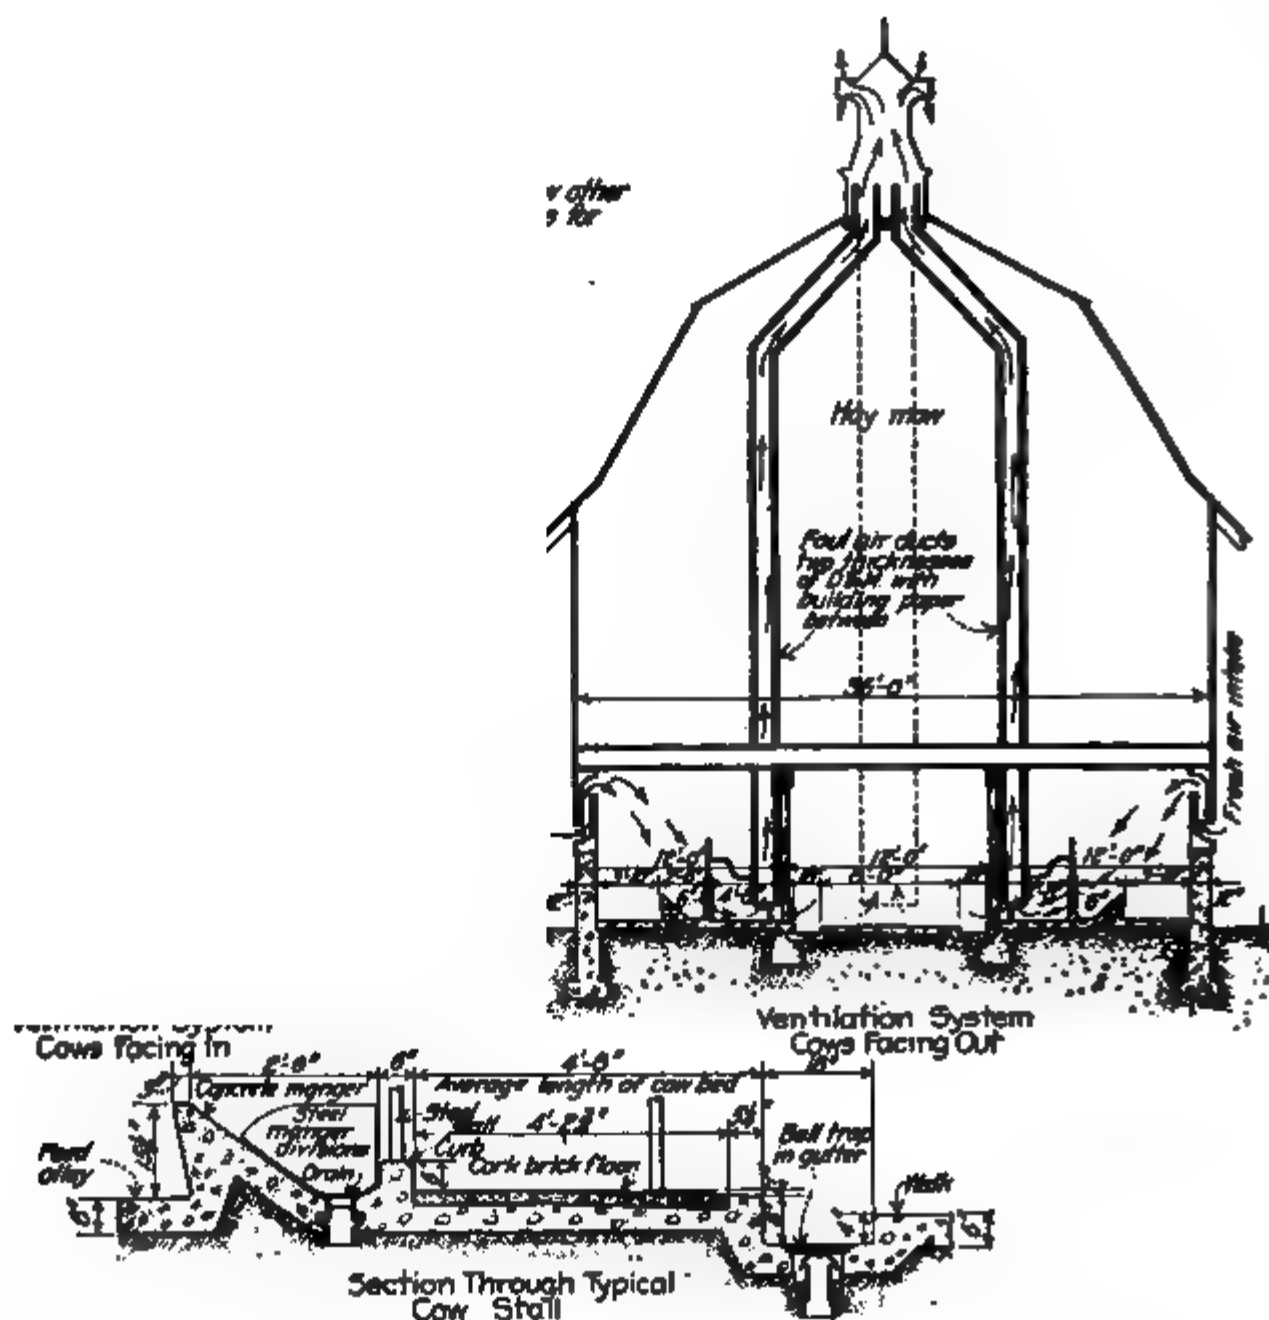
Typical sections showing ventilation systems and dimensions for general purpose farm barn.
